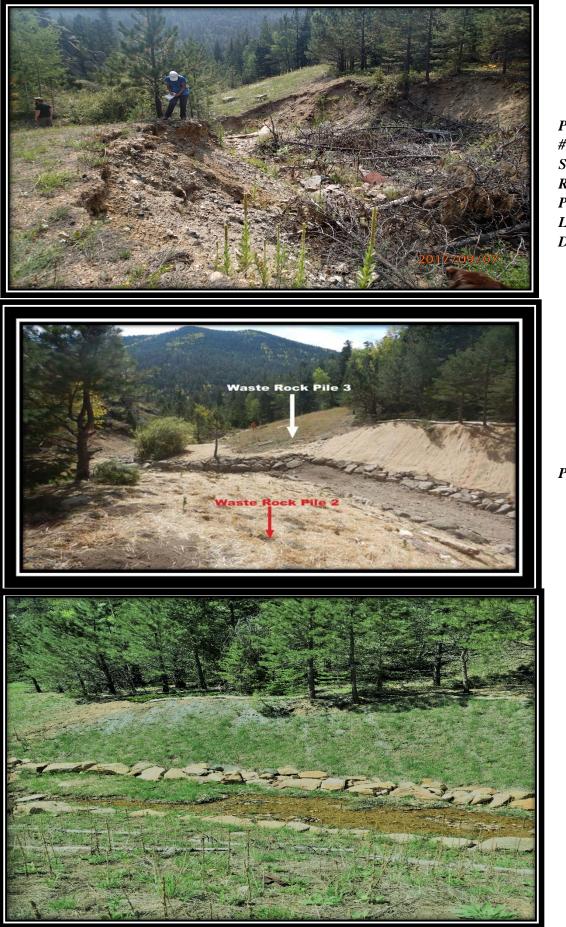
and #10- Reclaimed Cut Bank Slopes-Upper Repository is at the Top Left of the Photos
